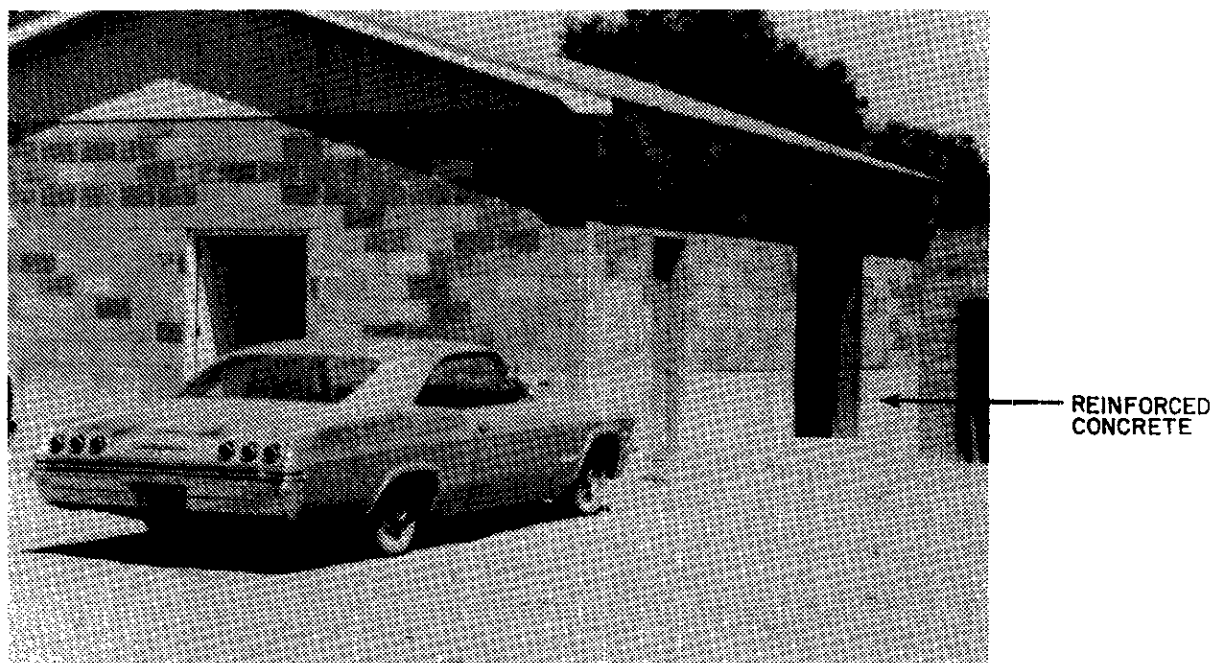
Plumbing supply business located on 2.5 feet of fill. Reinforced concrete extends 3 feet above ground, all doors are water tight. Note lack of windows. La Junta, CO.
